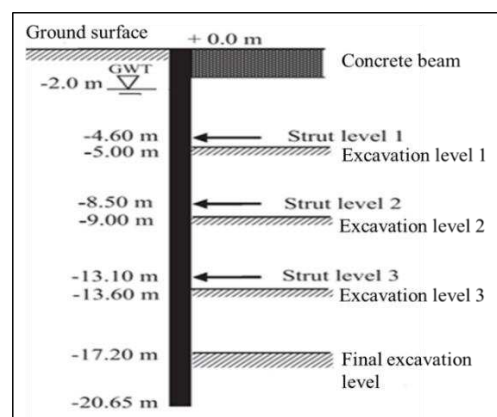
Typical wall cross-section (modified from Hohou, 2019).
